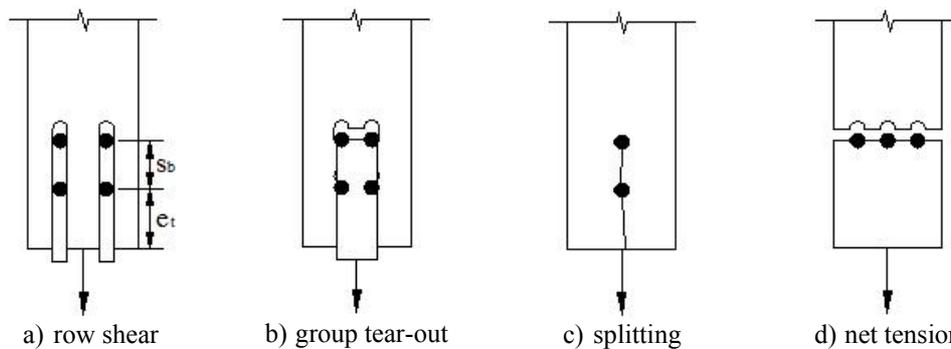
Observed brittle failure modes for timber bolted connections loaded parallel-to-grain
